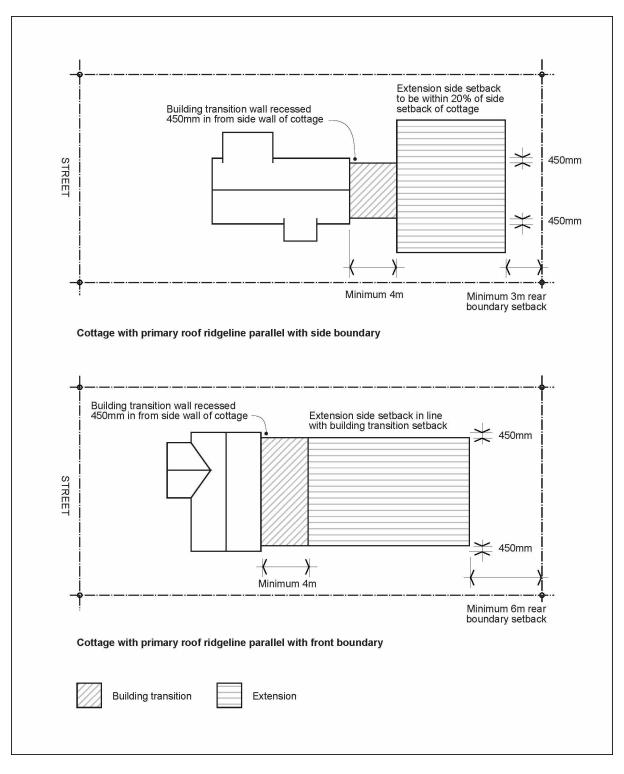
Figure B – Rear extensions are smaller in scale and visually separate to the original cottage through use of a building transition with recessed side walls.
